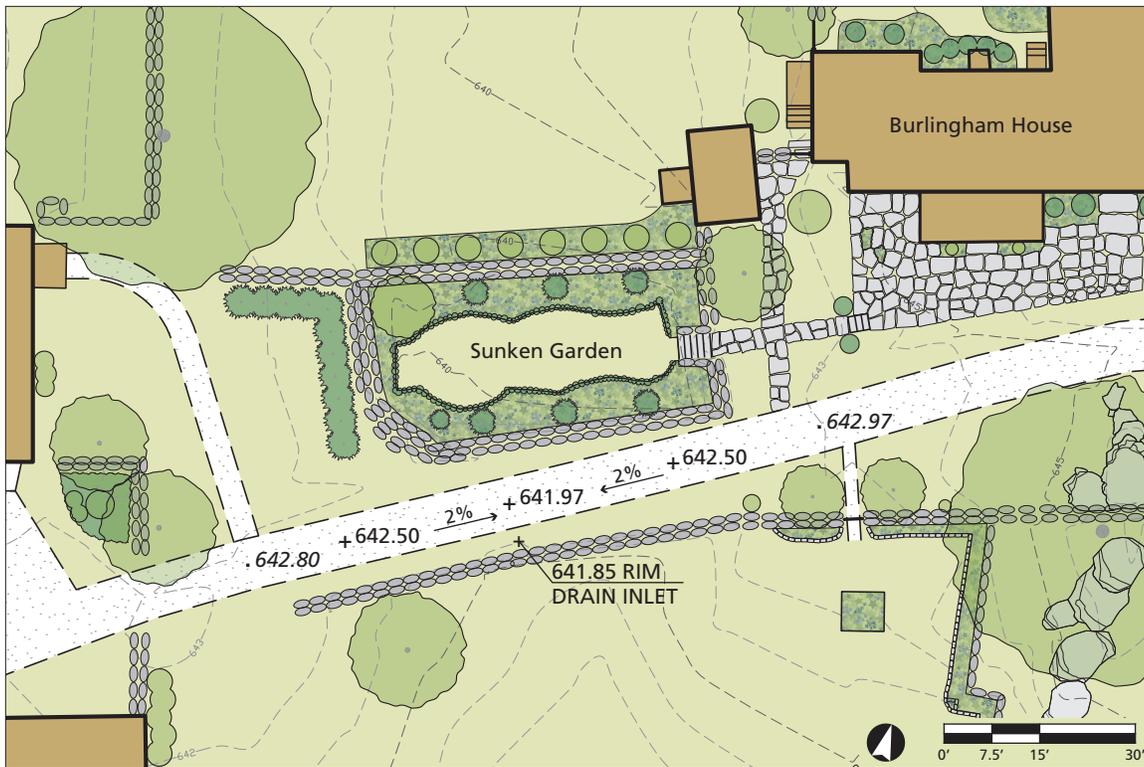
Schematic plan showing rehabilitated and improved drainage at the Burlingham driveway. The longitudinal slope of the driveway should be increasing in the area between the Sunken Garden and south meadow, 2012 (OCLP).
